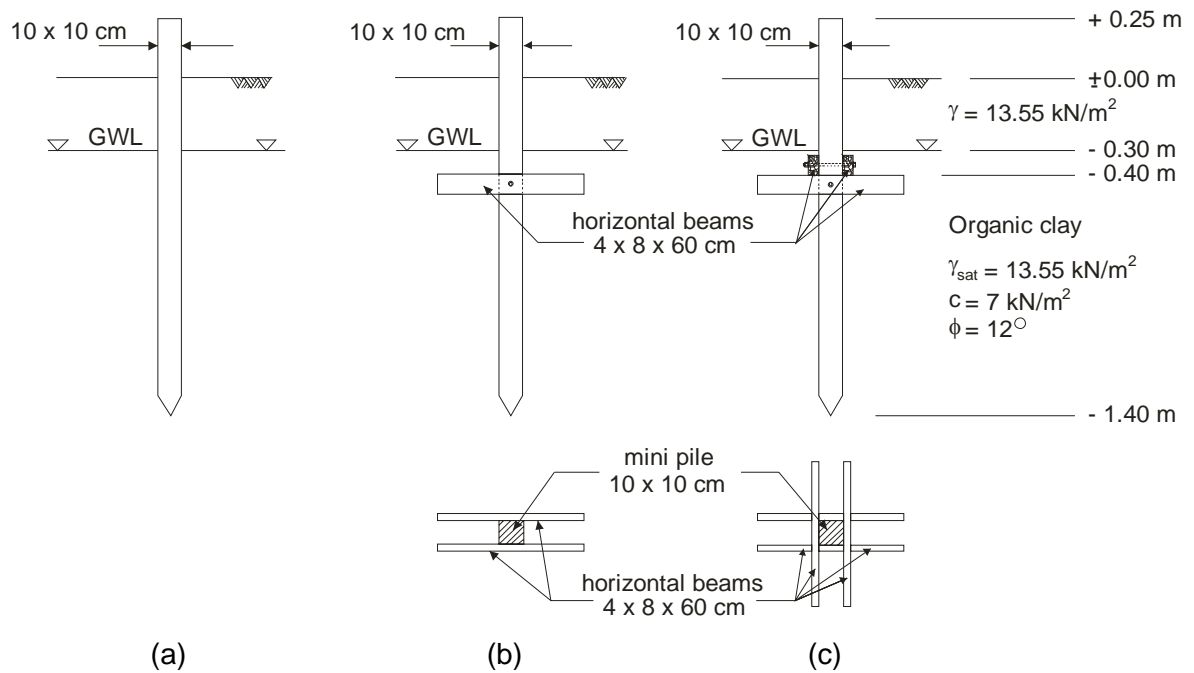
Models of Field Load Tests: (a) mini pile, T1, (b) mini pile with a pair of horizontal beams, T2, (c) mini pile with two pairs of horizontal beams, T3
